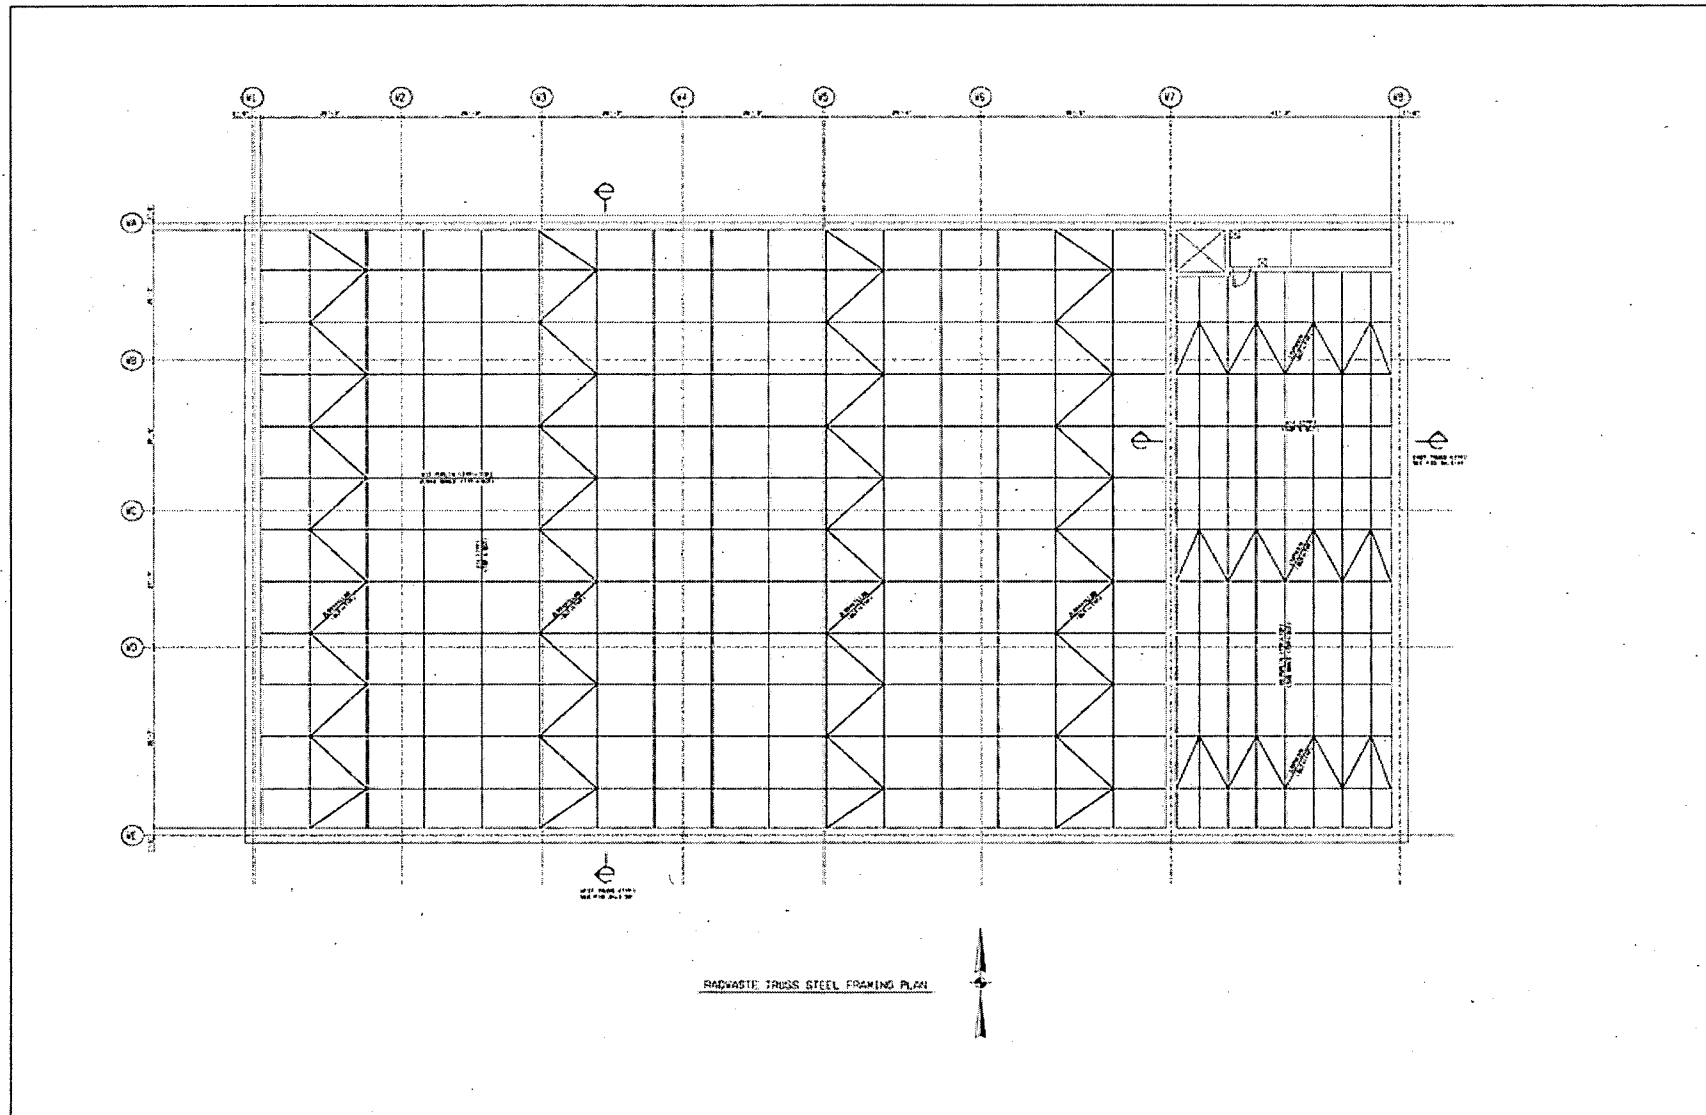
H.3-47 ROOF TRUSS, PURLIN AND HORIZONTAL BRACING LAYOUT (PLAN VIEW)
